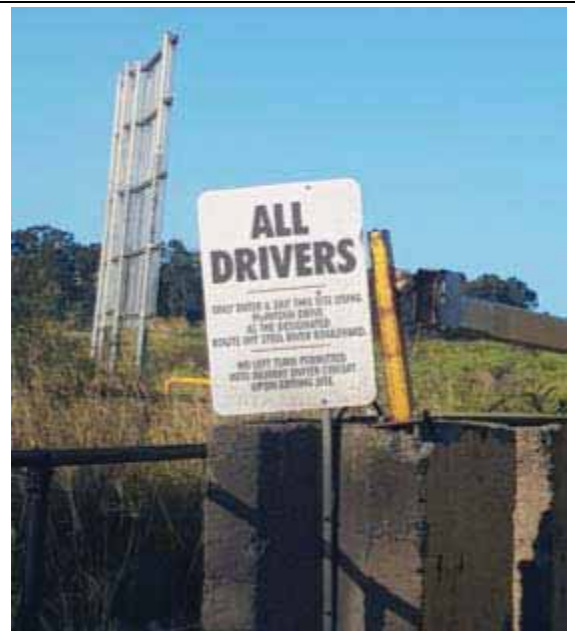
Sign on site exit directing vehicles to access site via McIntosh Drive and Steel River Boulevard.
